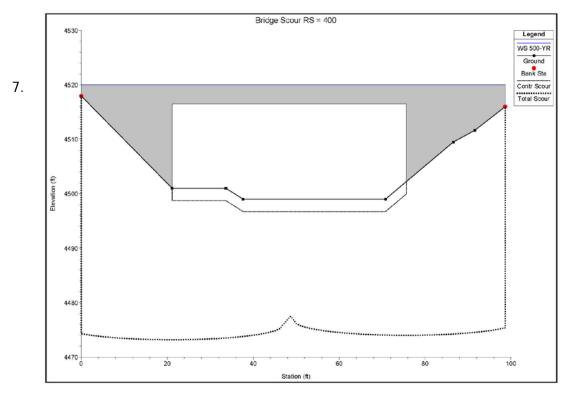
Cross-section of scour depth for 500-year flow of 8,100 cfs. Total combined contraction and abutment scour ranges from 27.84 feet on the left abutment to 28.26 feet on the right abutment.
